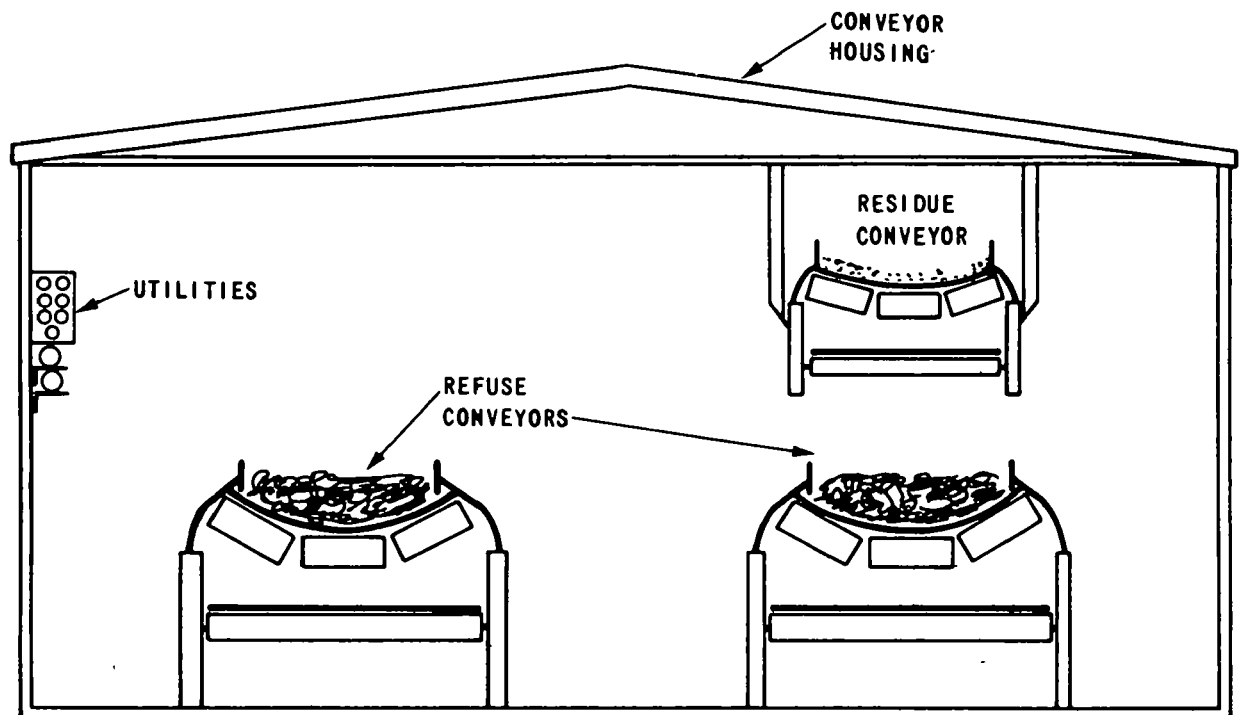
TYPICAL SECTION - CONVEYOR HOUSING ACROSS SAUGUS RIVER
